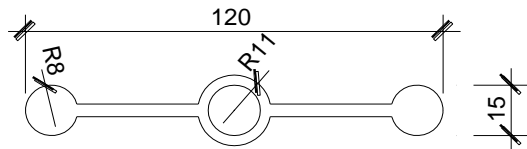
Vertical waterbar (PVC, polyvinylchloride) typical dimensions
